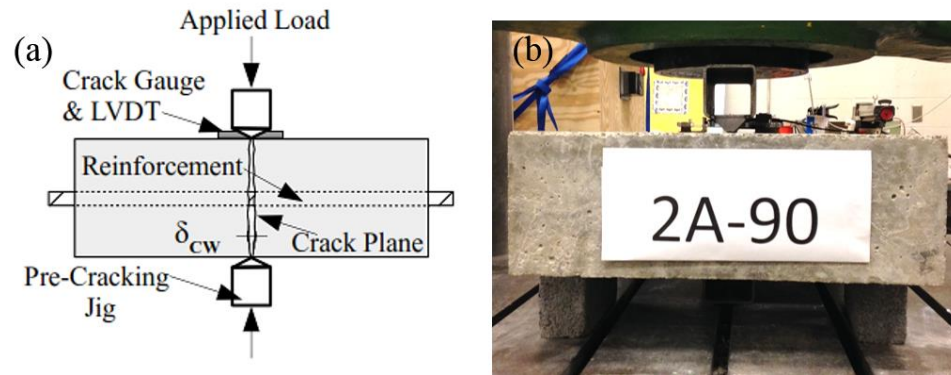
Pre-Cracking Test: (a) Detail; (b) Test Specimen
